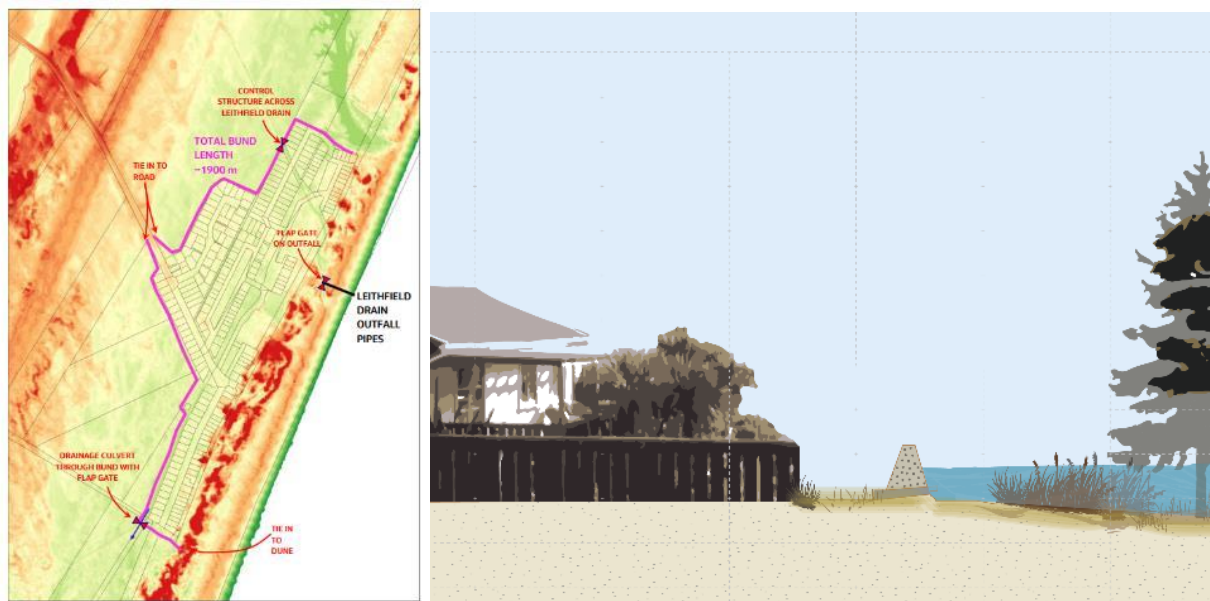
(Left) spatial layout of where the earth bund would be constructed in relation to the settlement. (Right) conceptual sketch of the bund.
